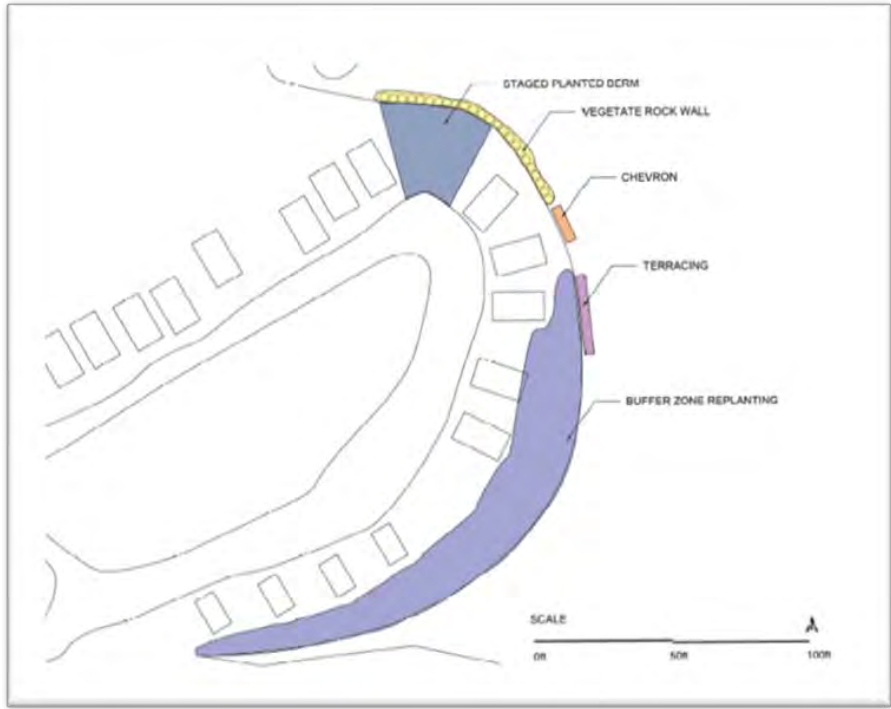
Sketch of 2020 plan for Ocean Surf Campground project
